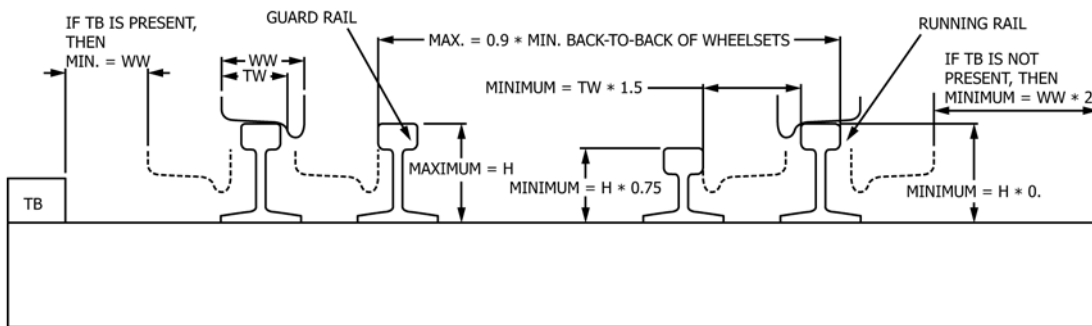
Bridge and Tunnel Guard Rails Recommended Maximum and Minimum
